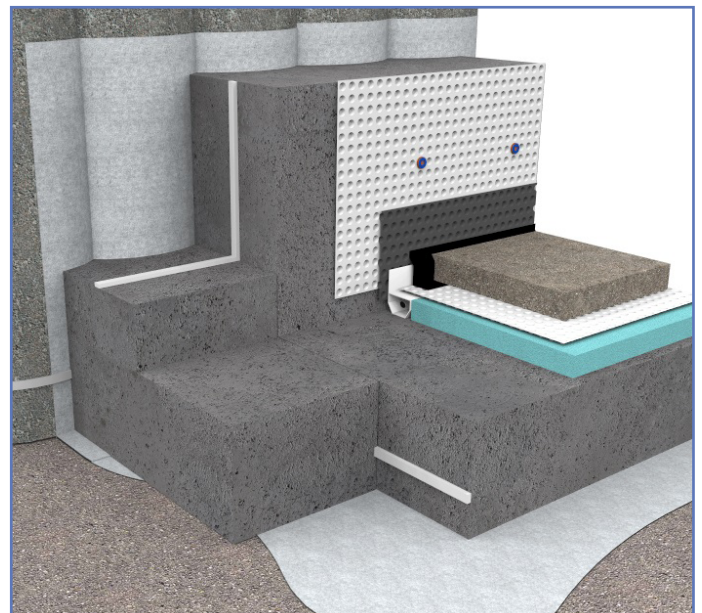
Comprehensive waterproofing with Type A protection externally, Type B protection integrally, and Type C protection internally
